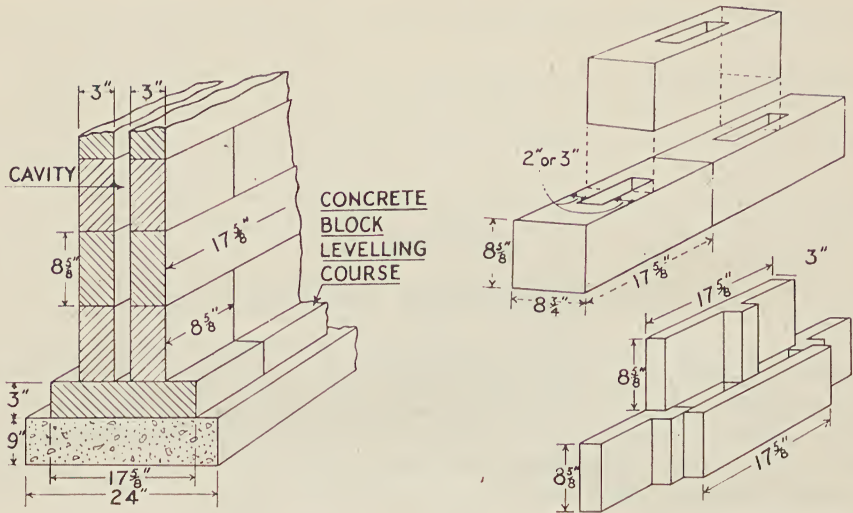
SOME TYPES OF CONCRETE BLOCKS.
